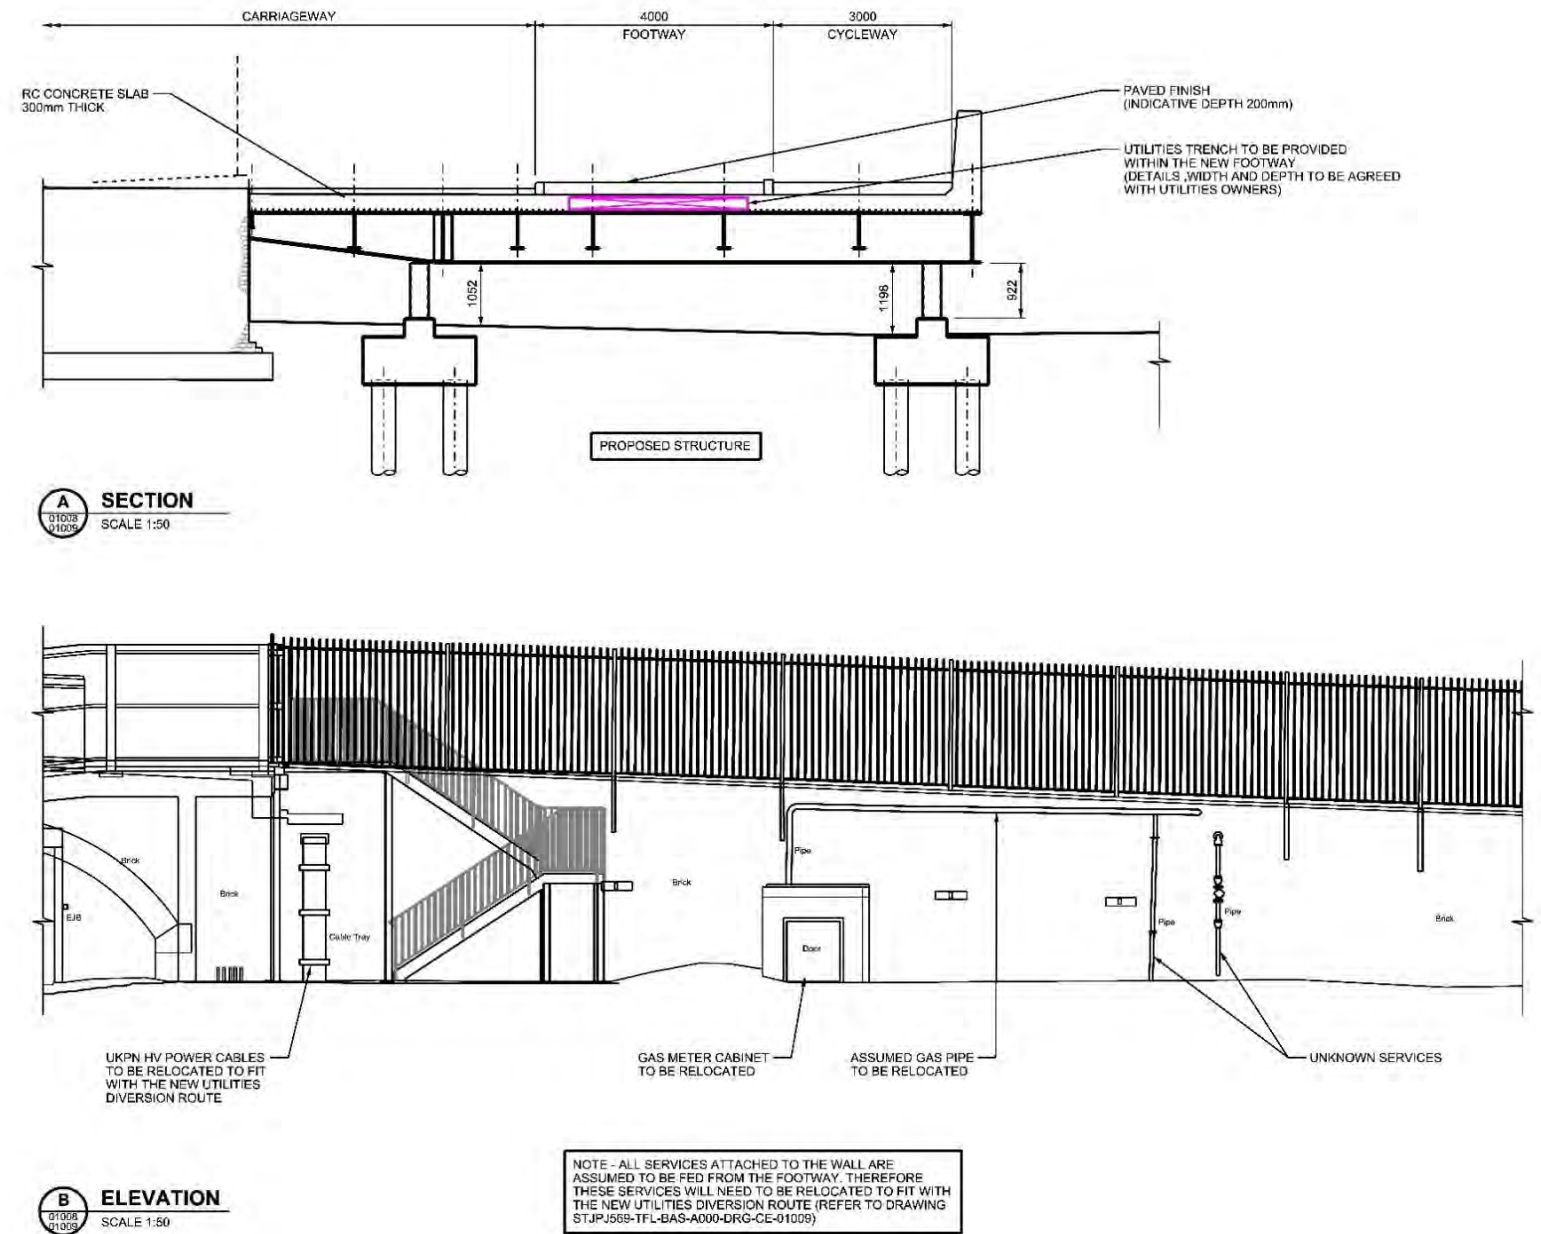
Catford Road Bridge Widening / Elevation (Source: TfL, 2023)
